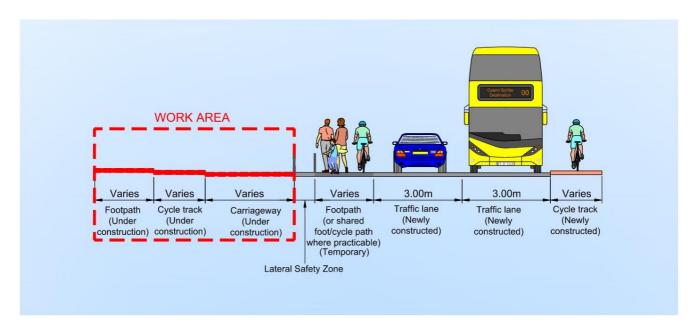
Traffic Management Cross Section, Section 1a – Stage 2
